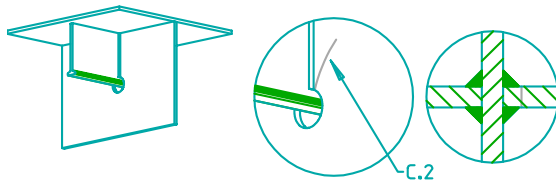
Open stiffener to crossbeam connection with a cope hole
